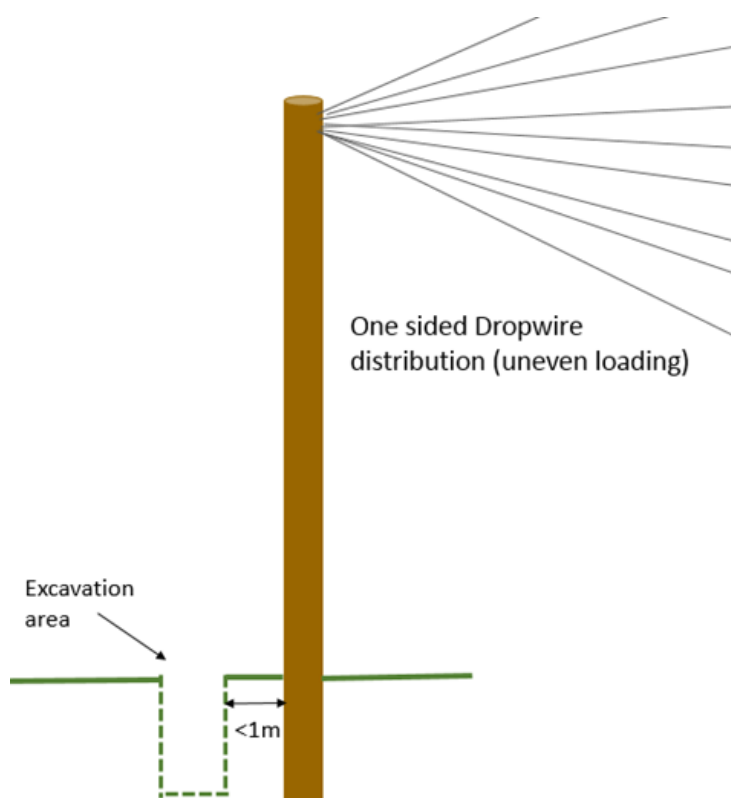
Sideway loaded Pole, excavation (l/h) < 1m
